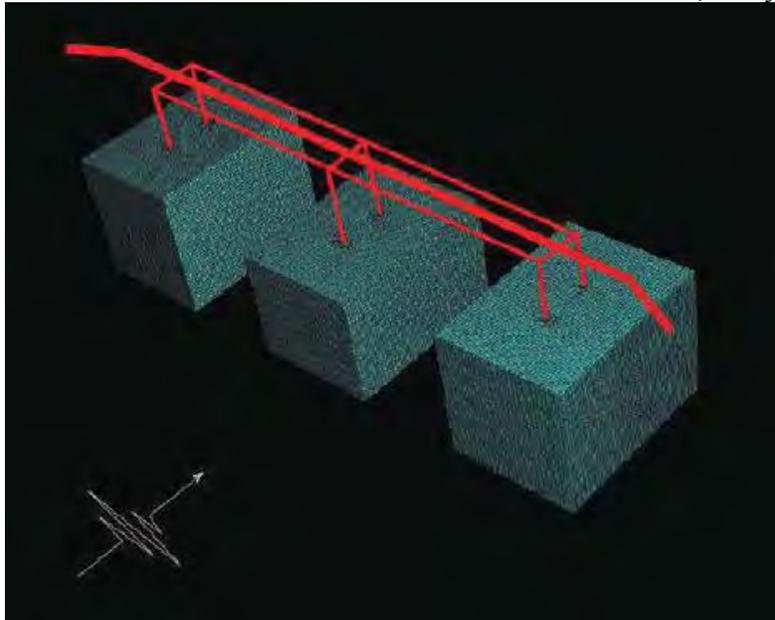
Detailed Three Bent Prototype Soil-Structure-Foundation Interaction Finite Element Model, Jeremic et al. (2009)
